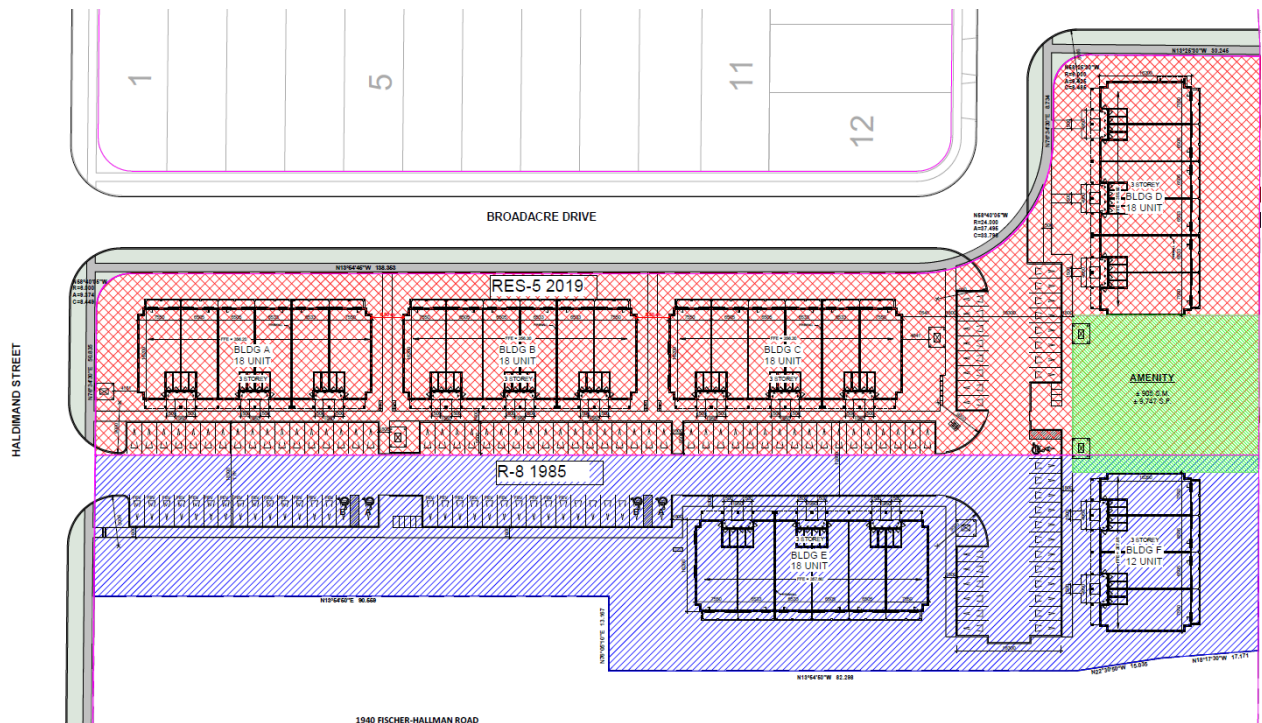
SITE PLAN AND ZONING BY-LAW OVERLAY
